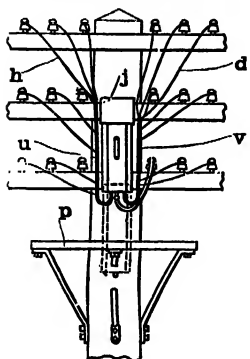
Distributing Pole Equipment with a Terminal Head
